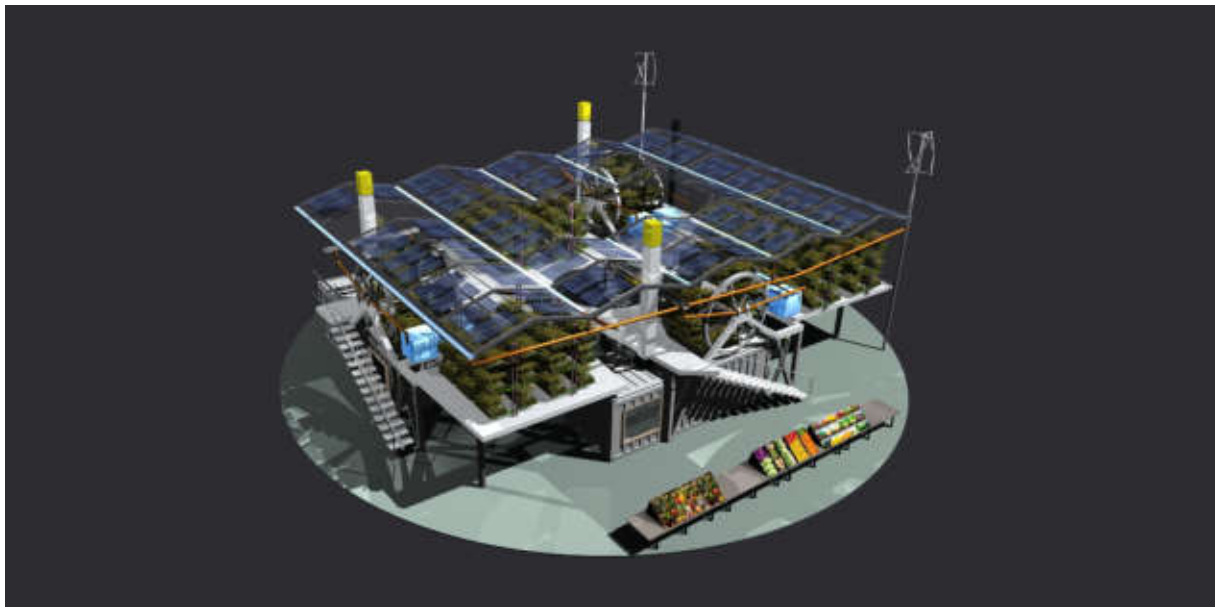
Multi roof: water and energy harvesting in glass roofs above a green roof
